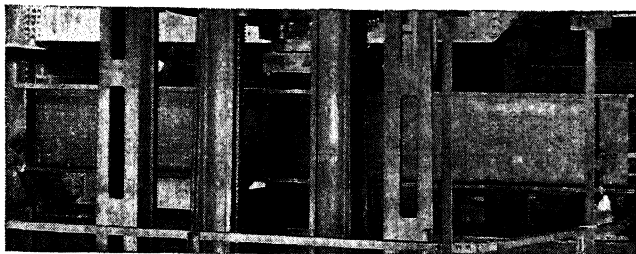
Specimen under initial load of 5,000 lbs. in million pound testing machine.
